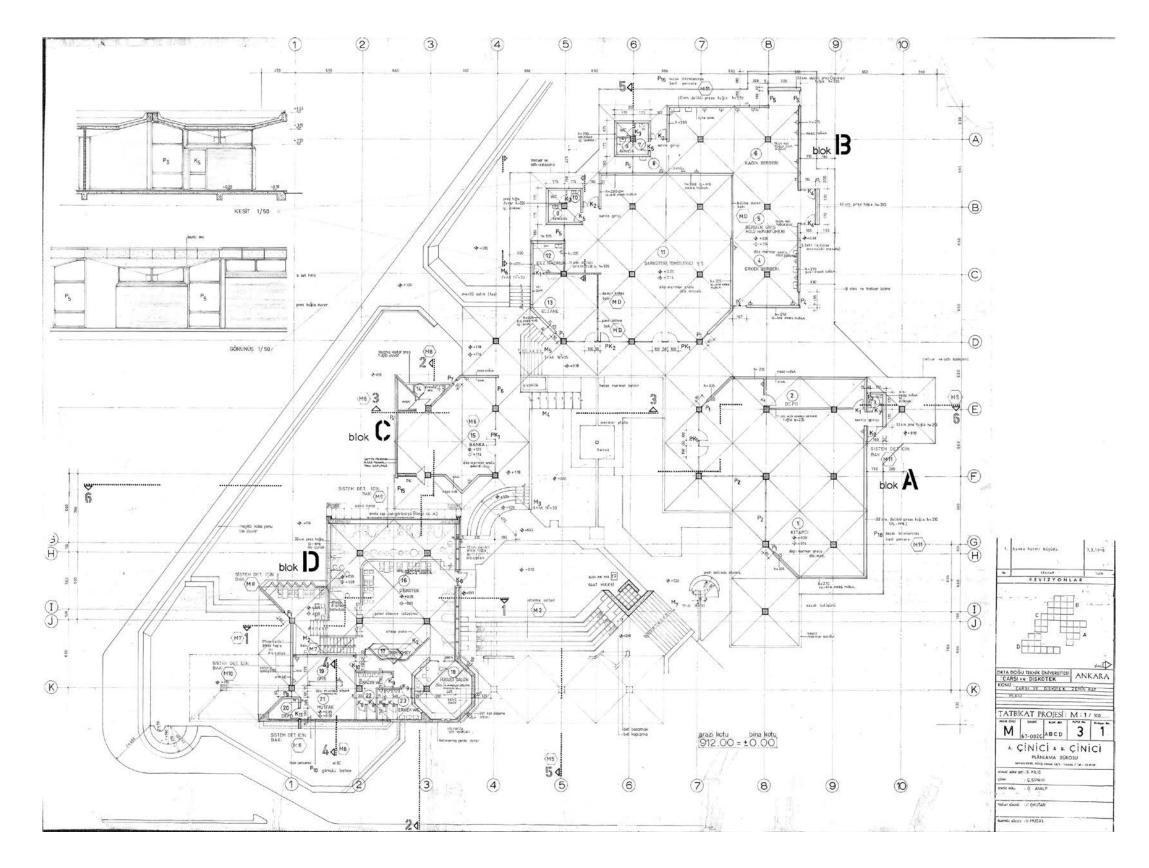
Original Drawing; *Çarşı* and Discotheque Ground Floor Plan Source: METU Directorate of Construction & Technical Works
